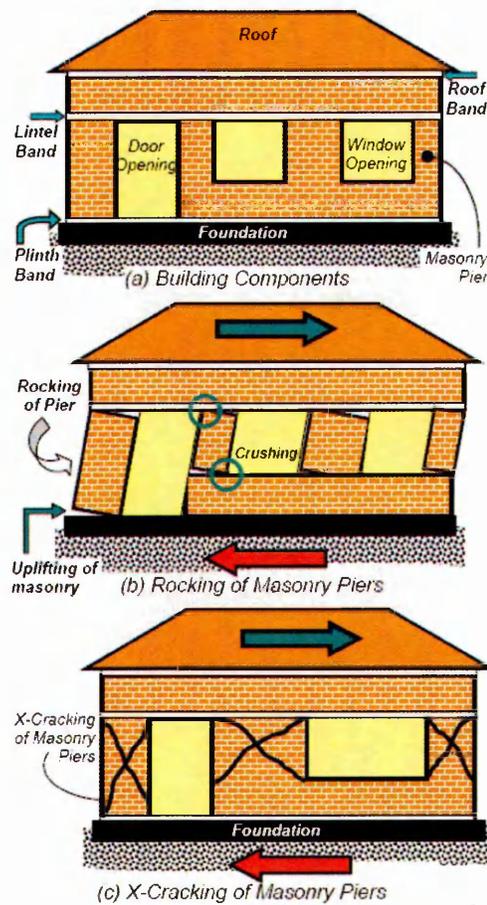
Earthquake response of a hipped roof masonry building; no vertical reinforcement is provided in walls (IITK-BMTPC, 2003)
